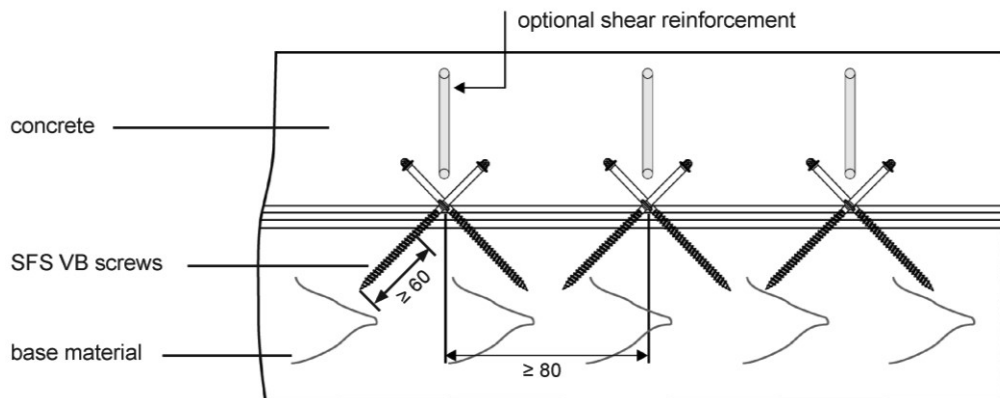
Principle structure of wood-concrete composite slab kit with SFS VB screws
